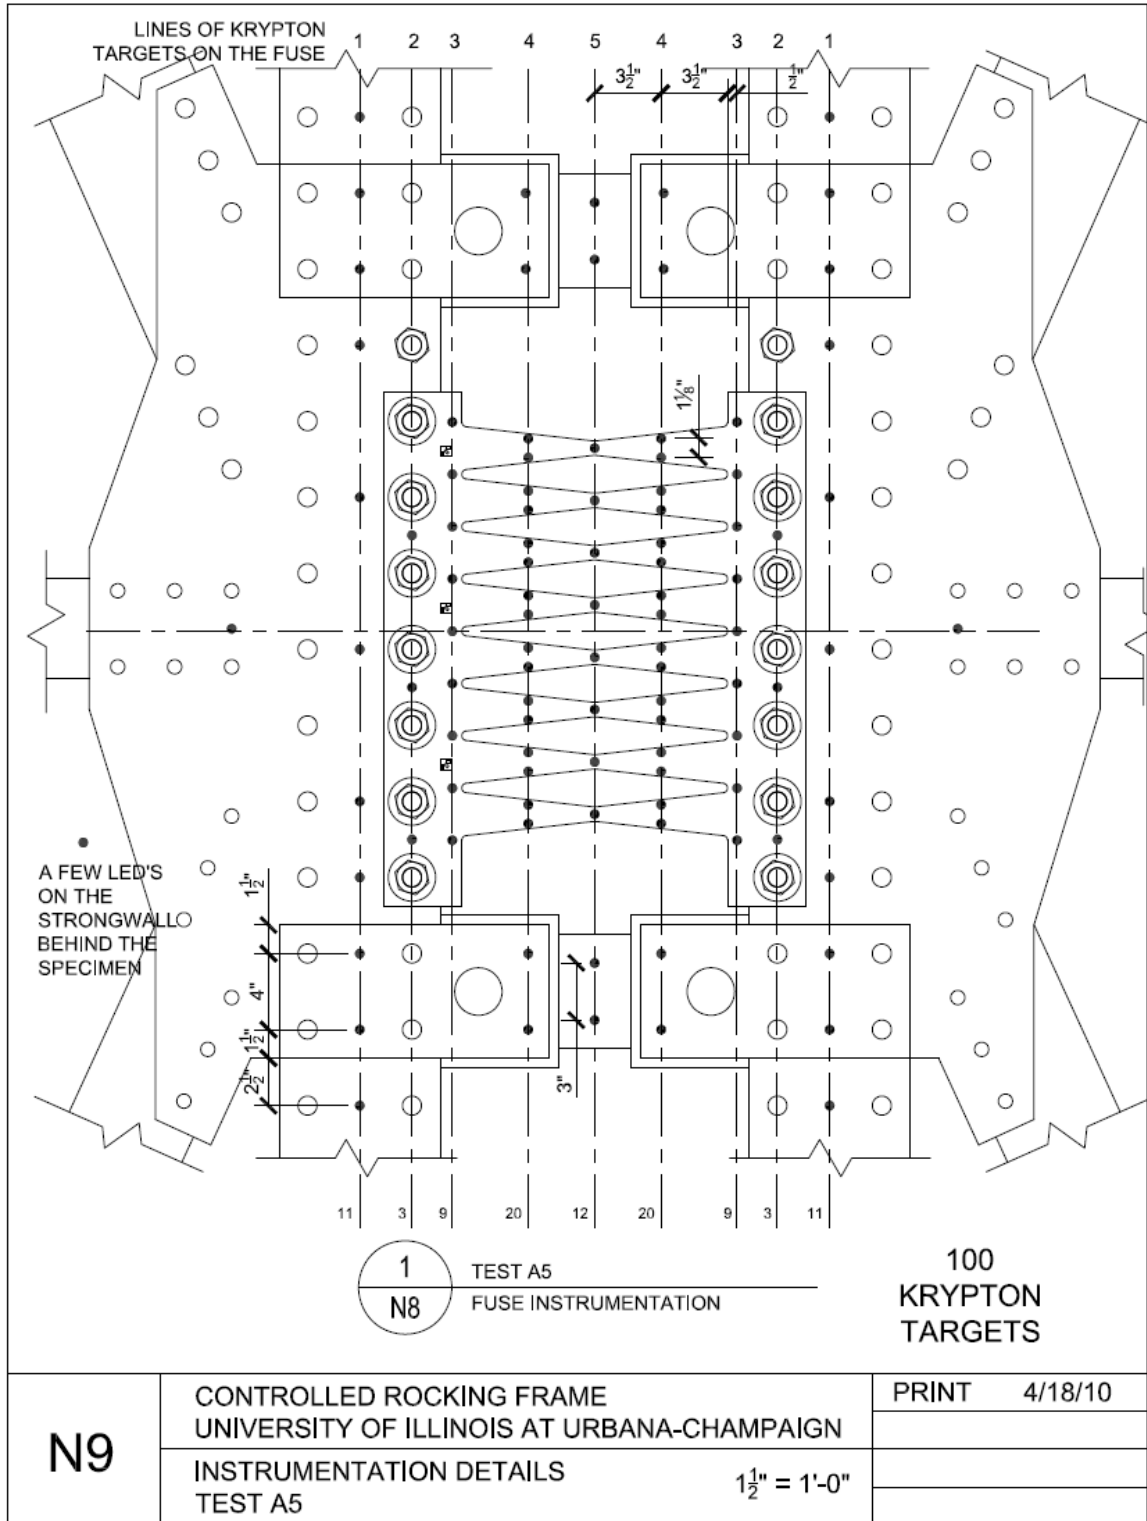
Instrumentation Plan Drawing – Krypton LED's for Specimen A5
